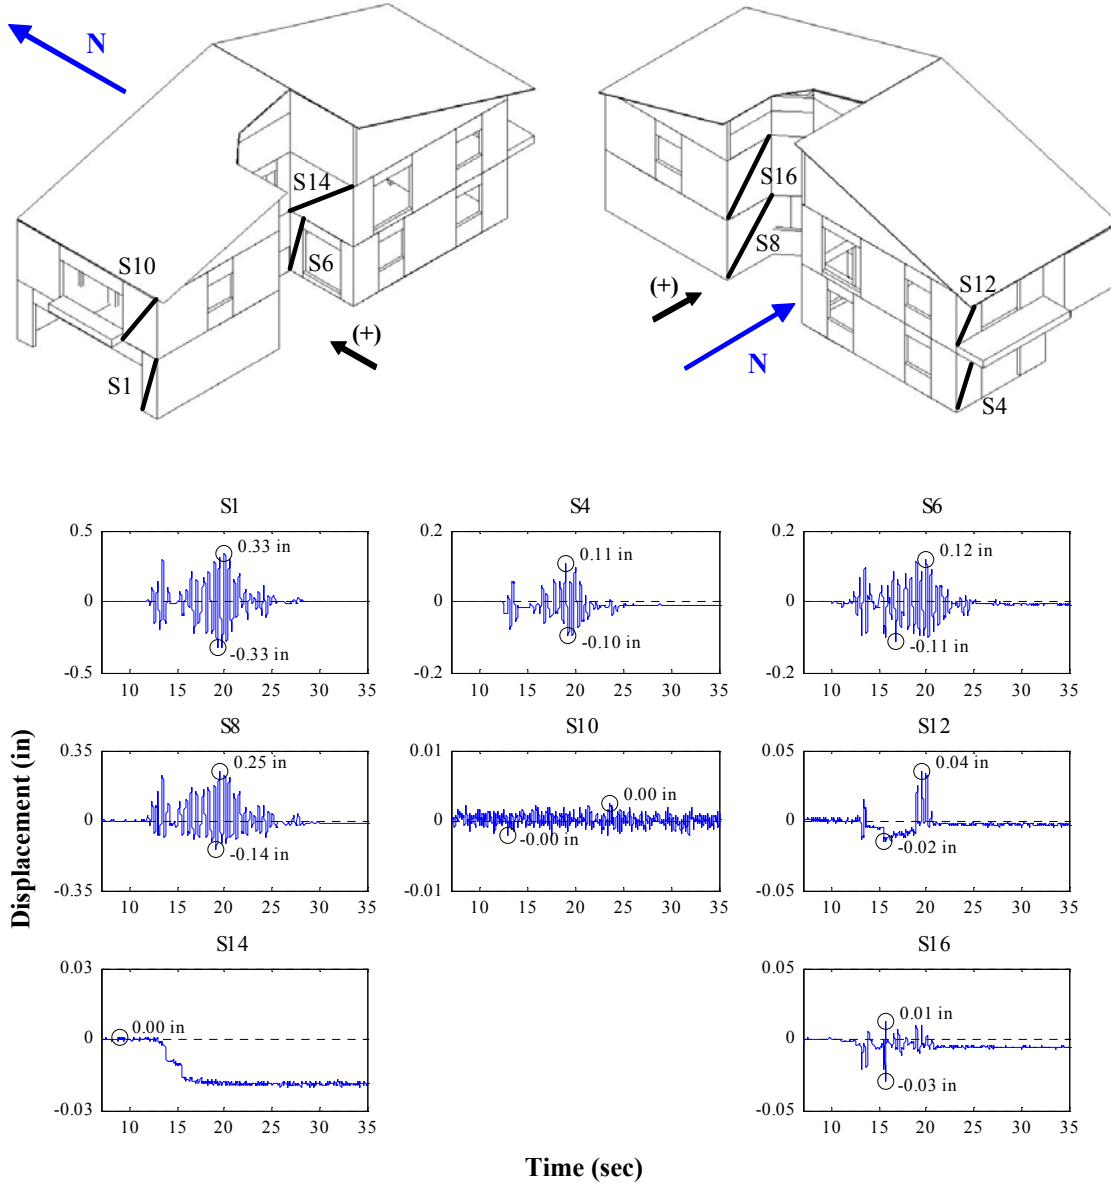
Wall deformations of north-south external walls for Test NWP5S05
